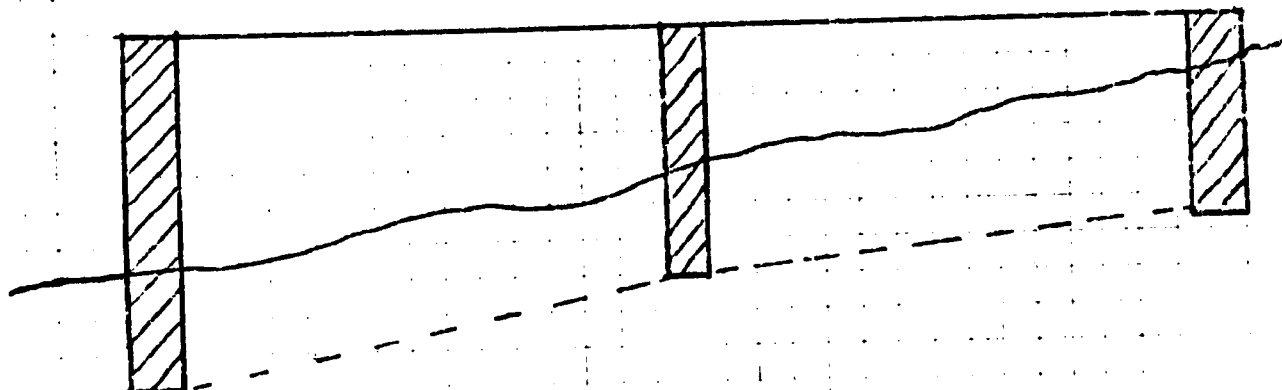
FOUNDATION AS LOW-CEILING GROUND FLOOR
